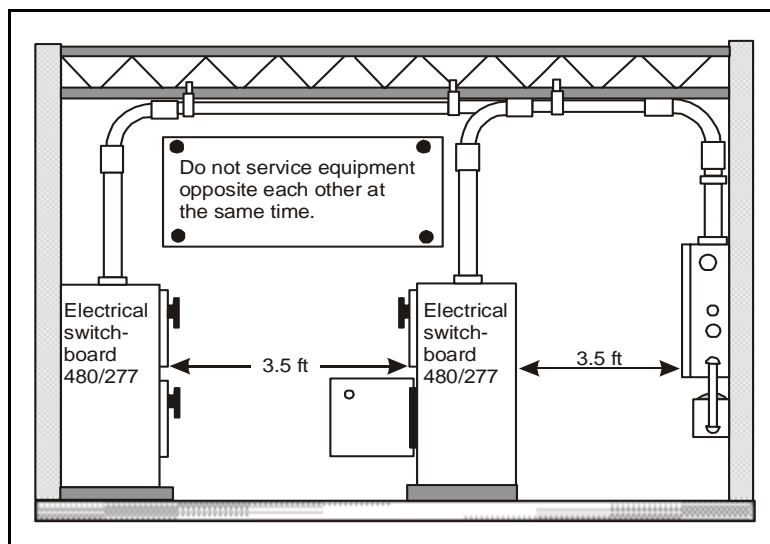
Access and working space requirements around enclosures and equipment.
